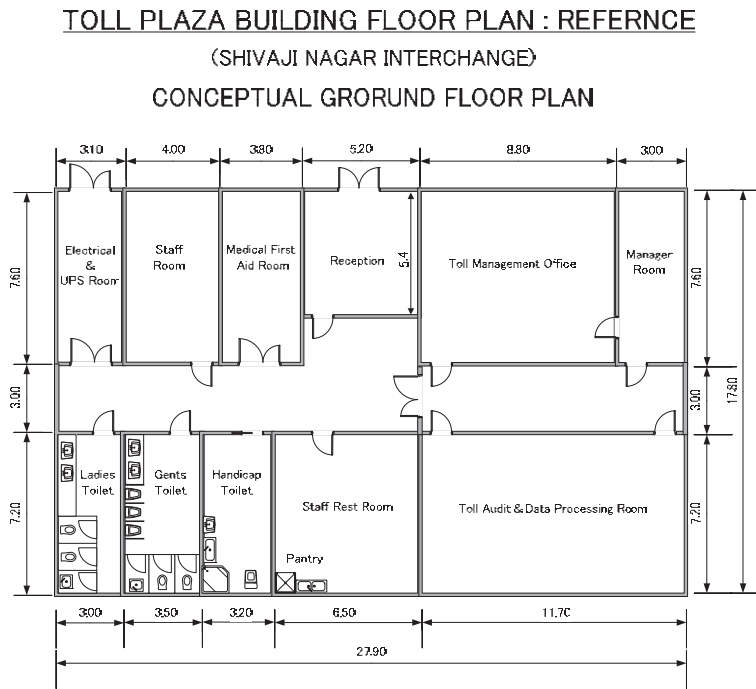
Layout Plan for the Toll Plaza (Recommended)
